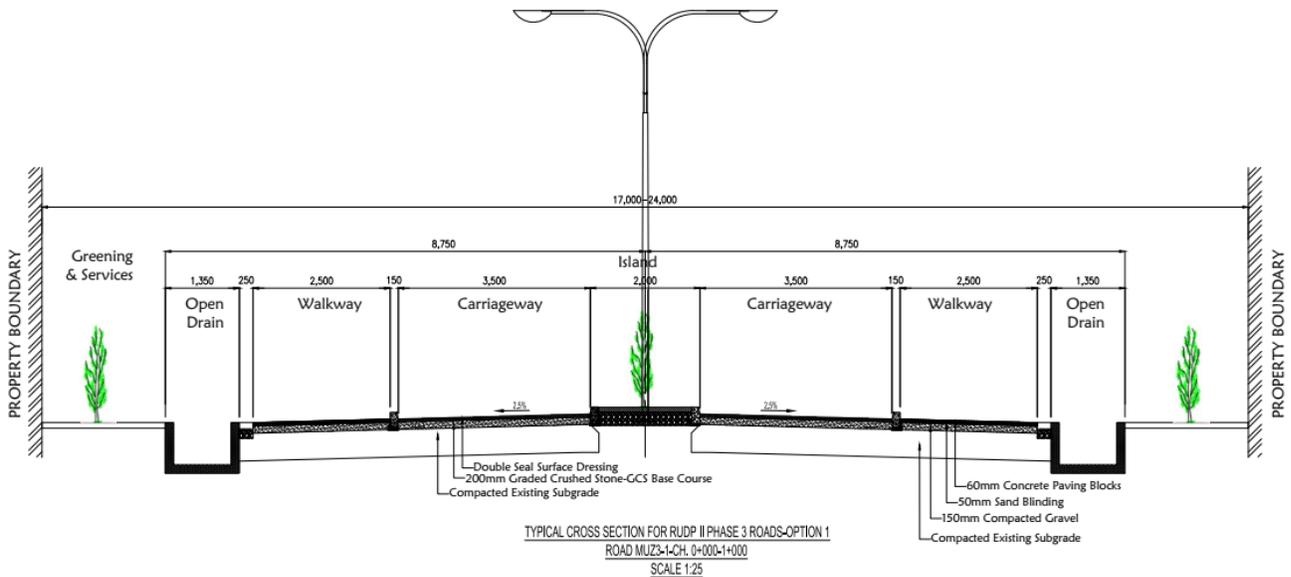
2: Typical road cross-section Option 1 (width 17m)
